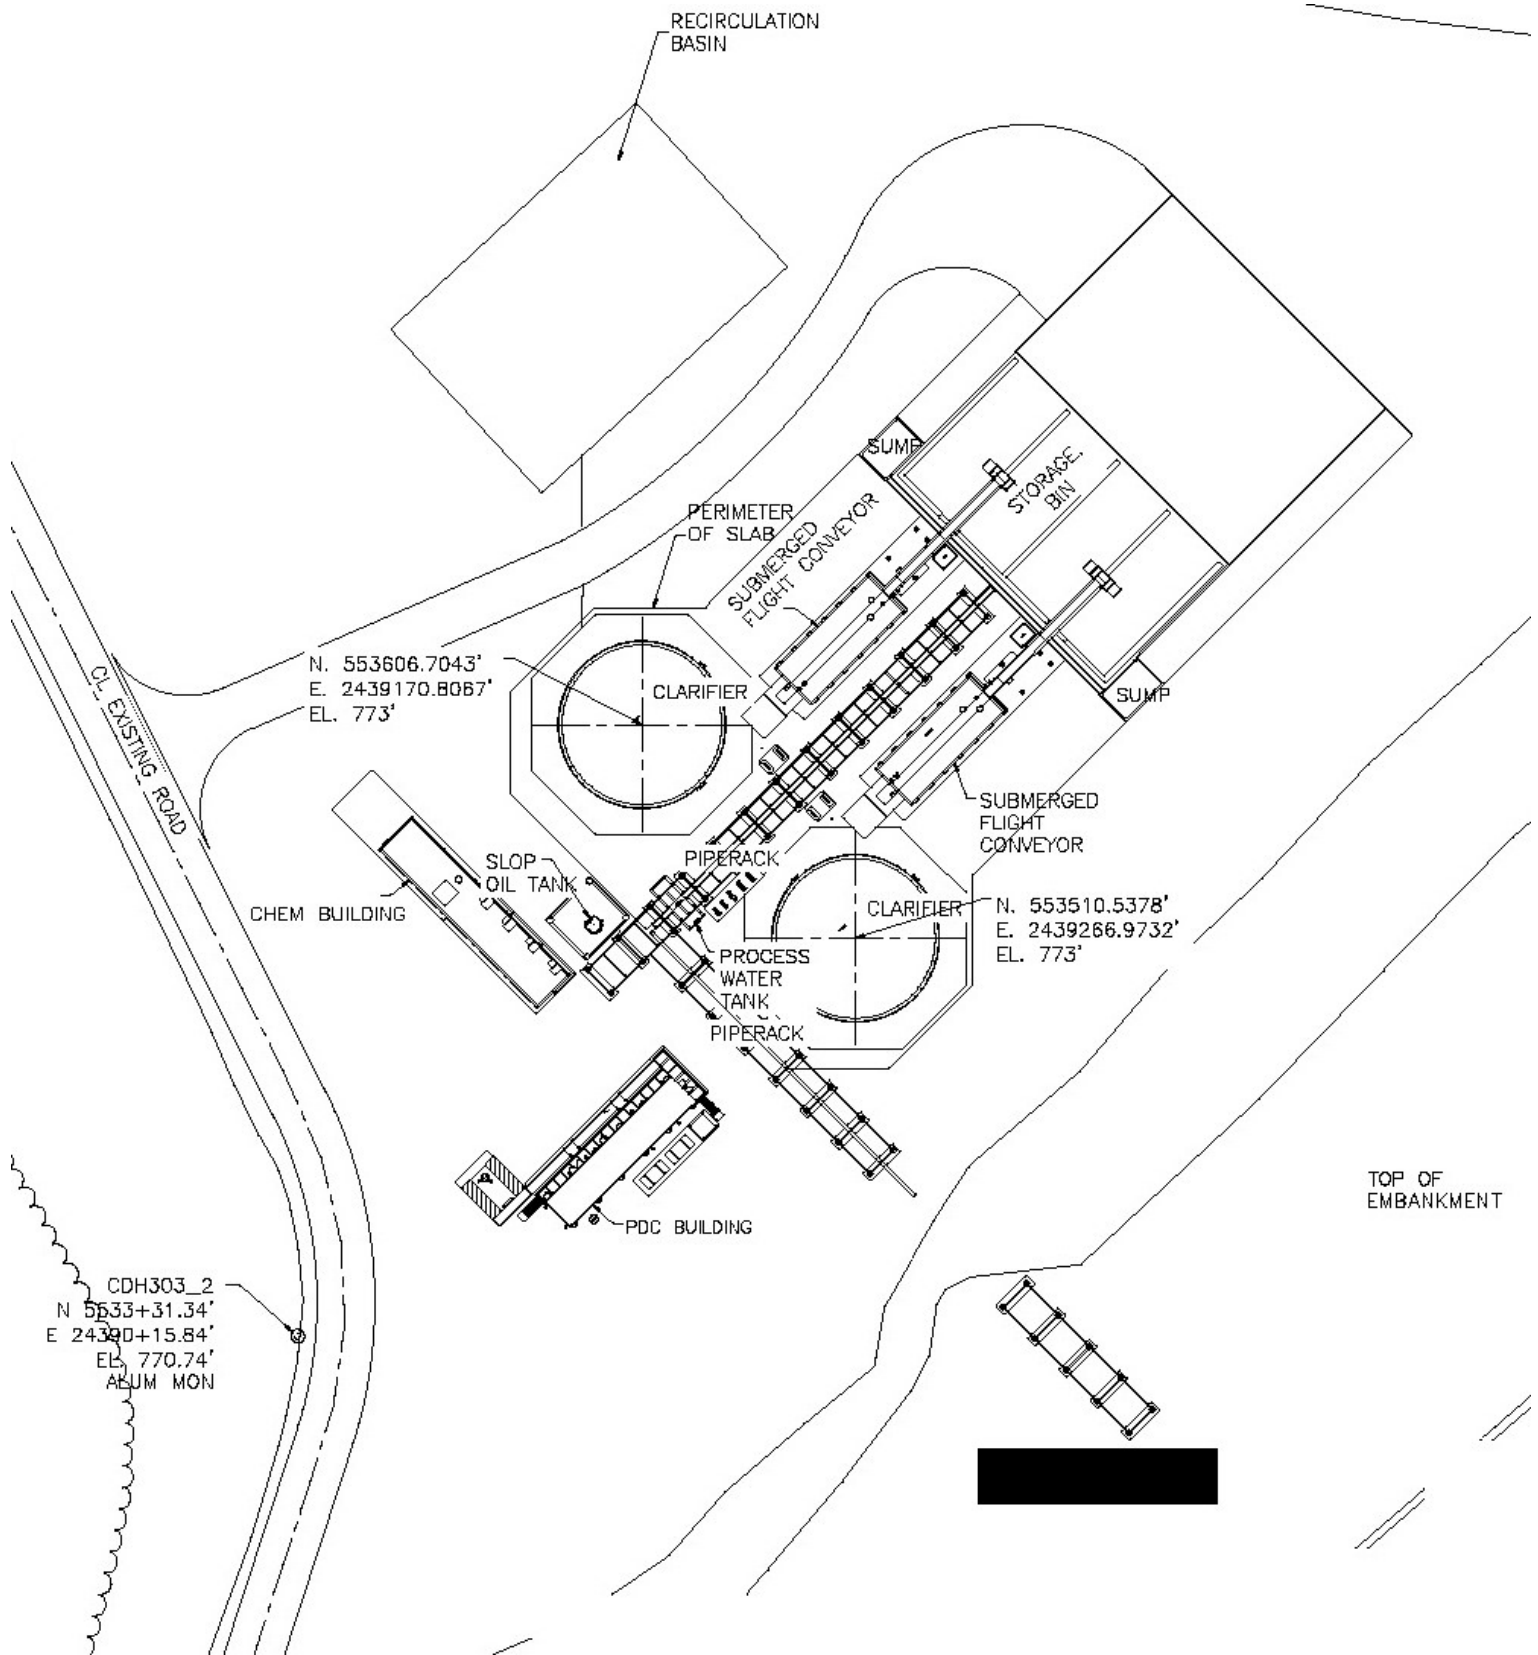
Proposed Dewatering Facility Civil Design Drawing
